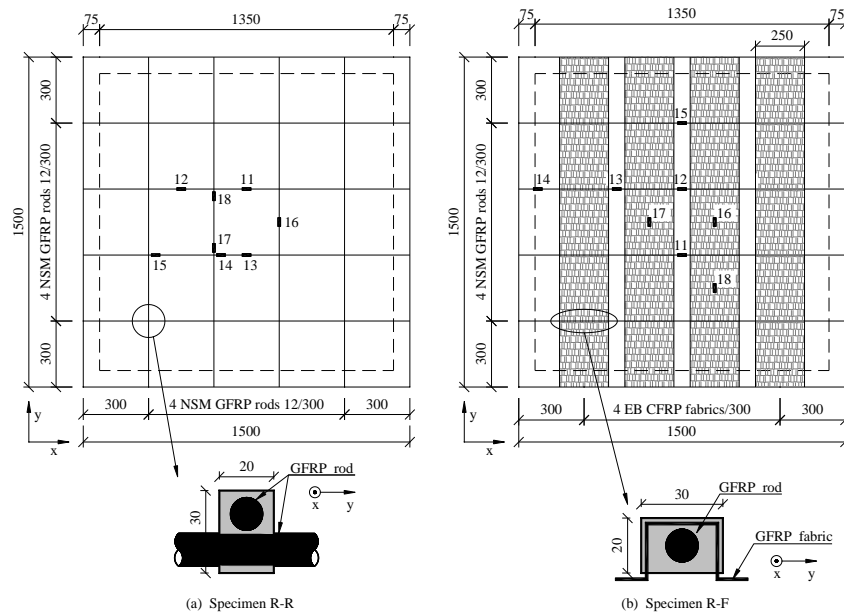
Schematic layout of strengthened specimens and FRP reinforcement details at the grooves intersection.
